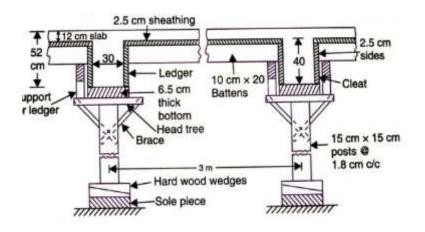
Shuttering For Beam and Slab Floor
